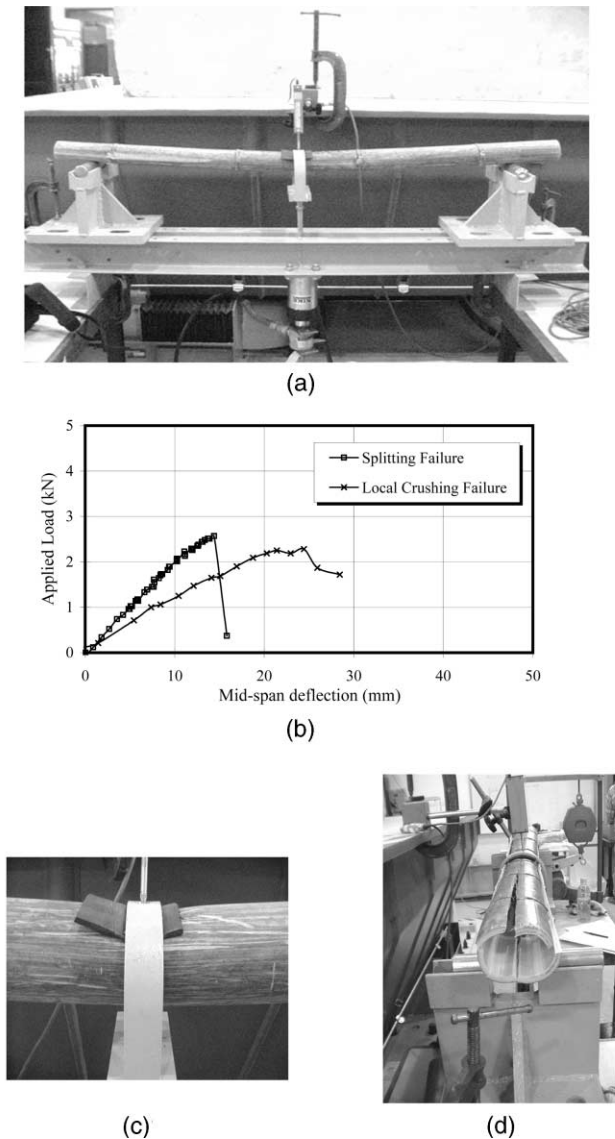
Bending test. (a) General test set-up. (b) Load deflection curves. (c) Typical failure mode—local crushing. (d) Typical failure mode—splitting.
